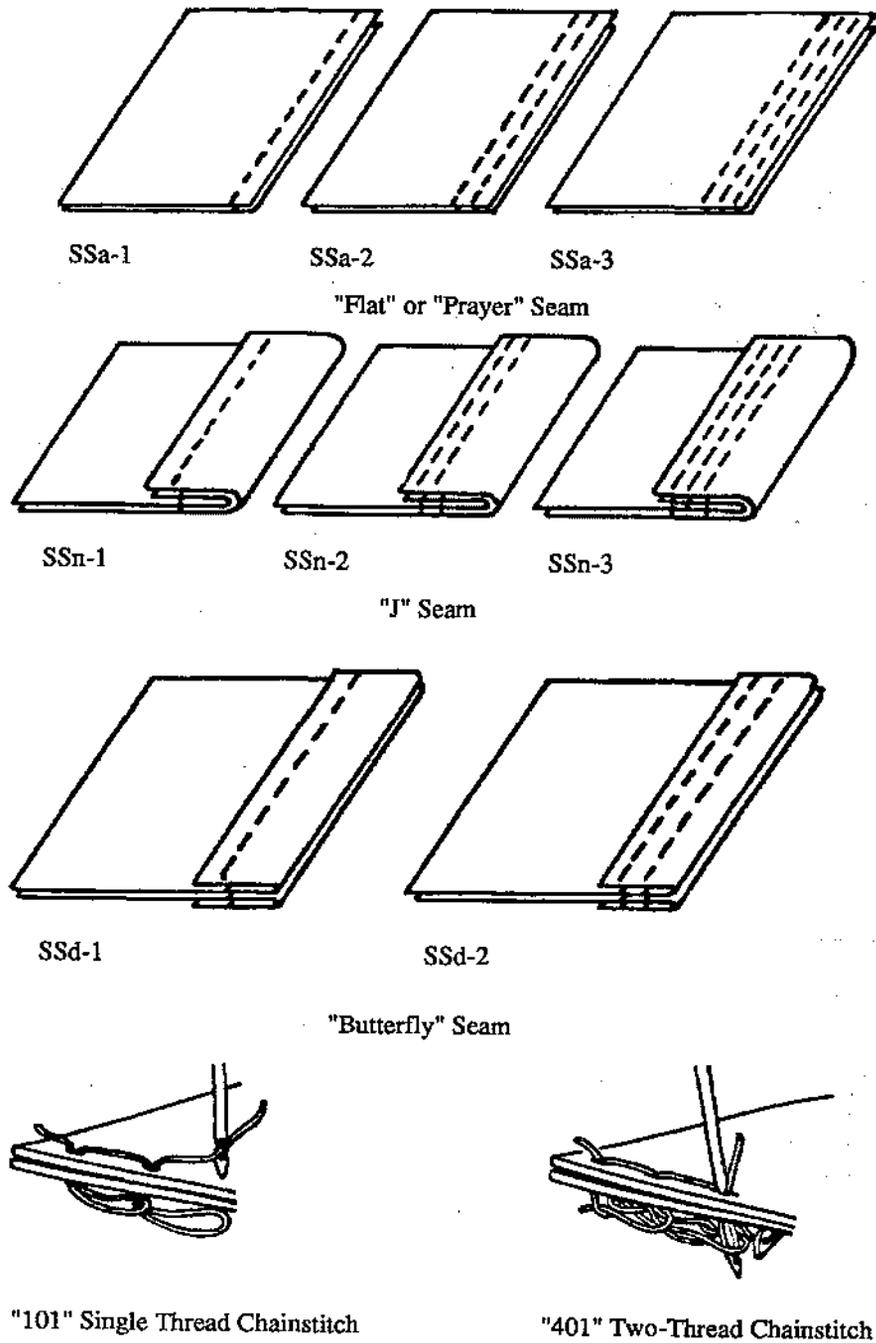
Various Types of Sewn Seams for Joining Geotextiles (after Diaz, 1990)
